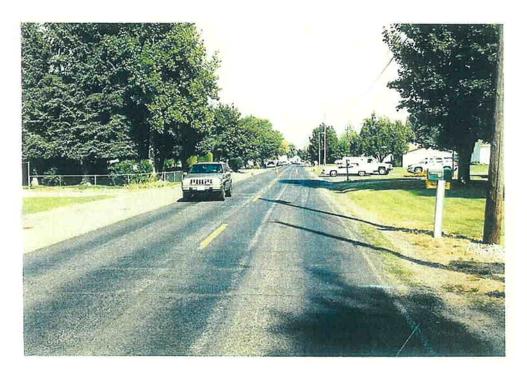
Photograph Looking Eastbound on 8th Avenue Taken Approximately 668 Feet to the West of the POI.
